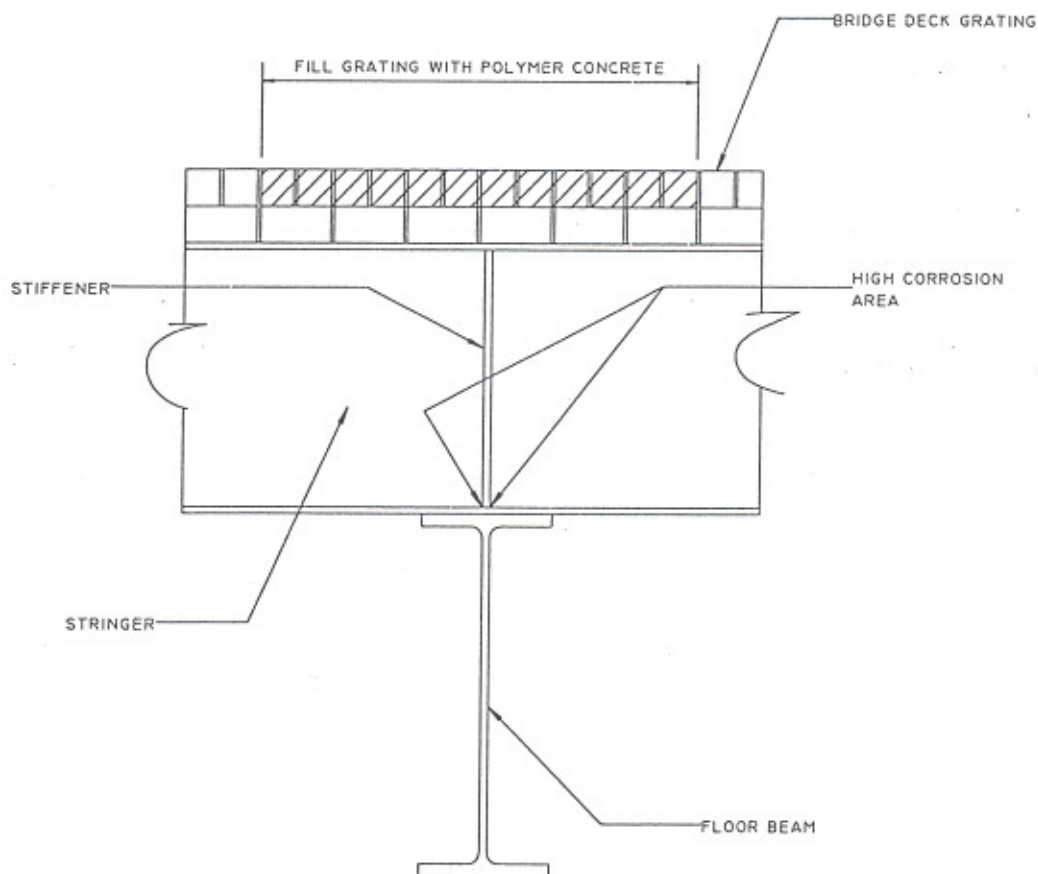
SHIELD THE STRING AND FLOOR BEAM FROM DEPOSIT BY FILLING A STRIP OF GRATING ABOVE THE FLOOR BEAM
